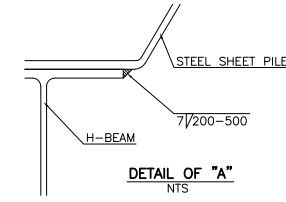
DETAIL OF STEEL SHEET PILE WITH VERTICAL WALL
